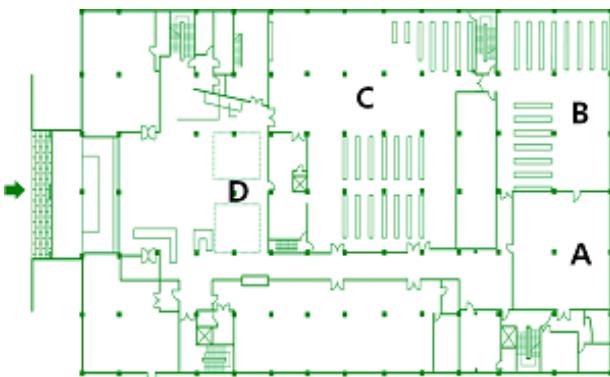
The 2nd Floor Plan of the Central Library of KUL
